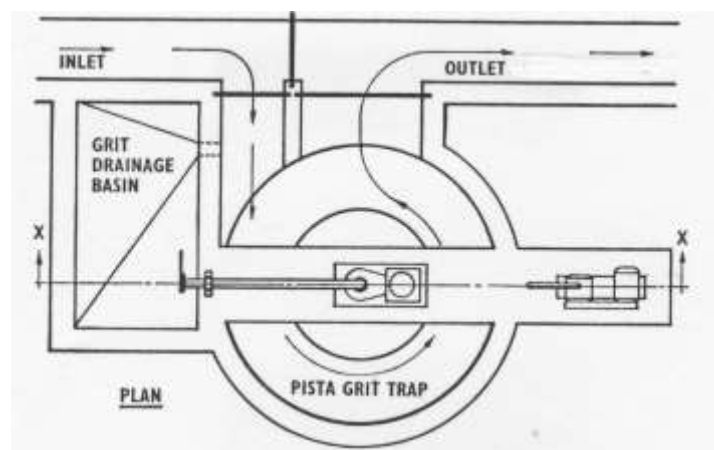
PISTA GRIT TRAP – PLAN VIEW.
